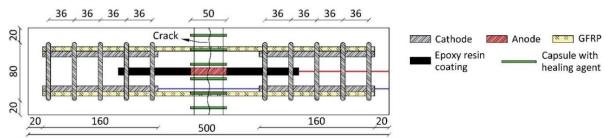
Reinforcement scheme and capsule positions in the concrete prisms (dimensions in mm) – top view.
